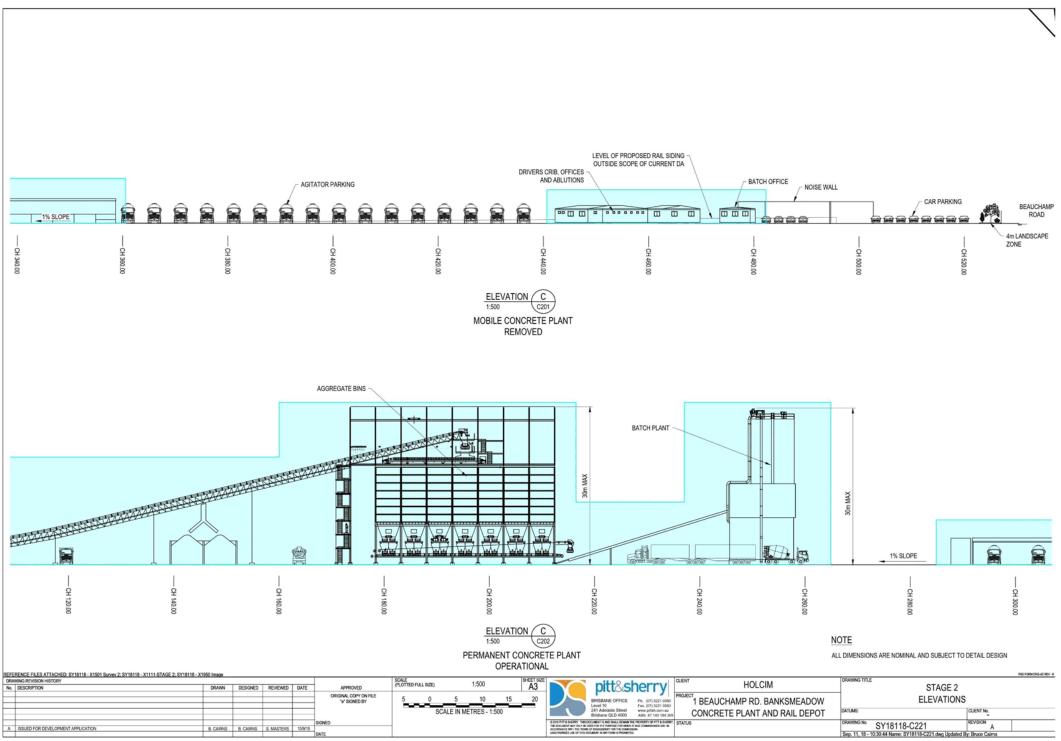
Stage 2/3 Elevations (Subject to Detailed Design)
